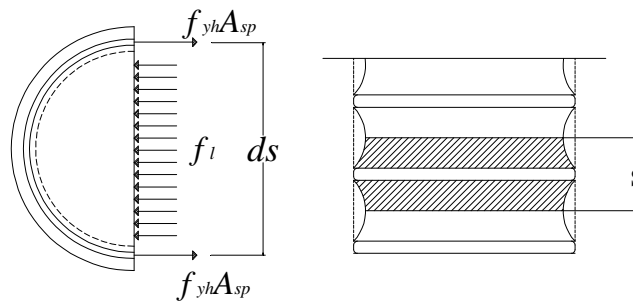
Confinement forces on concrete from circular hoop reinforcement
